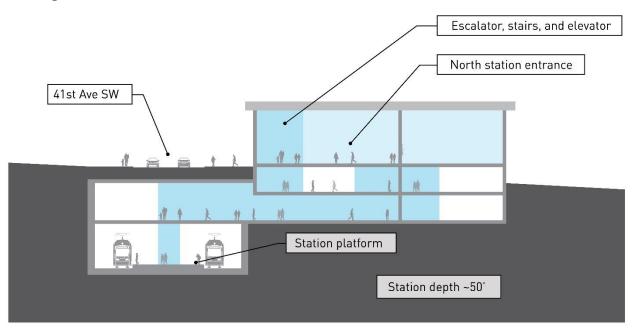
Alaska Junction Station Cross Section for Alternative WSJ-5a
